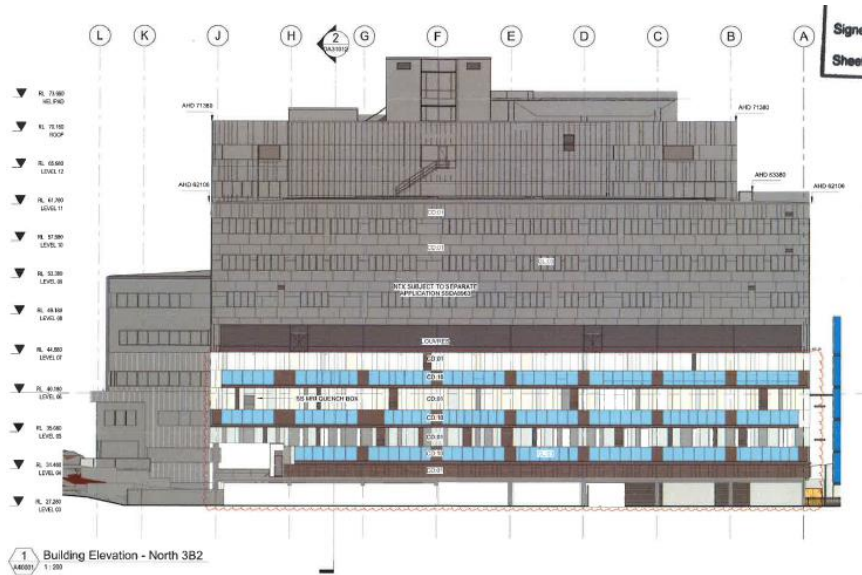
Approved Northern Elevation Plan (Source: CGA)
